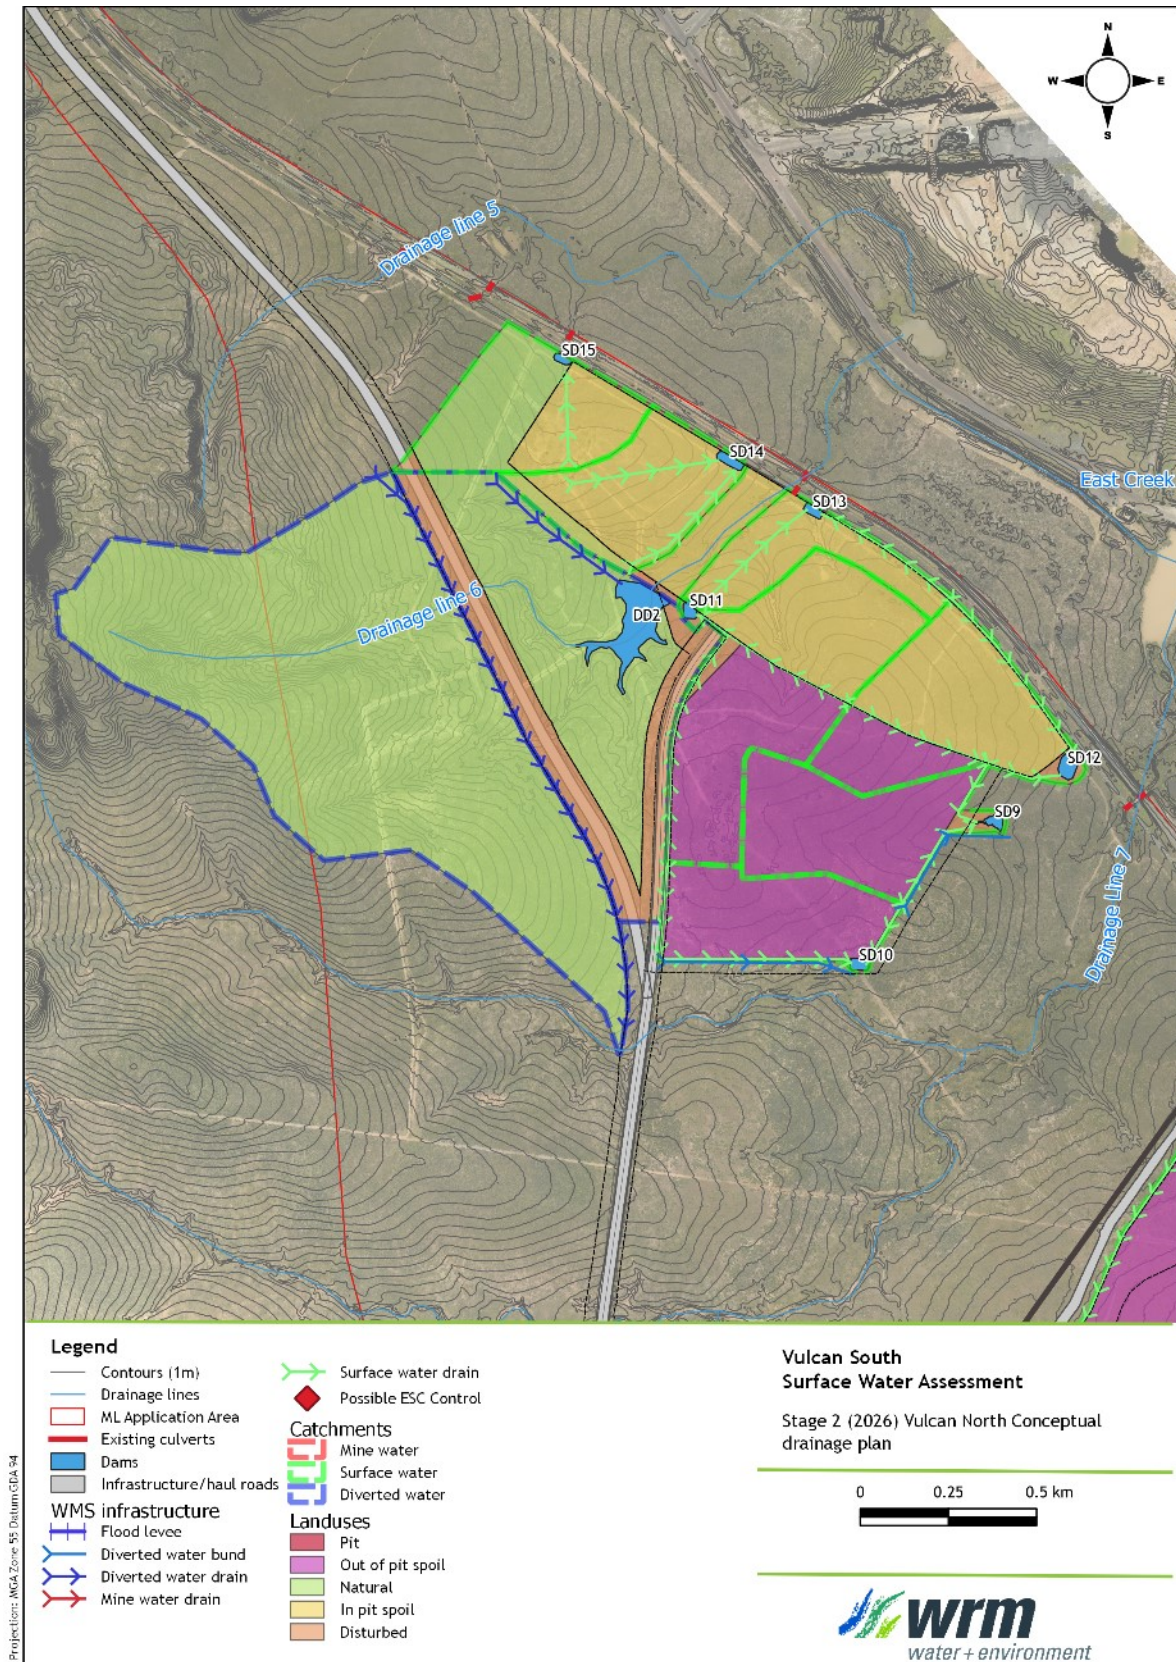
Stage 2 (Year 2026) Vulcan North mining area conceptual drainage plan
